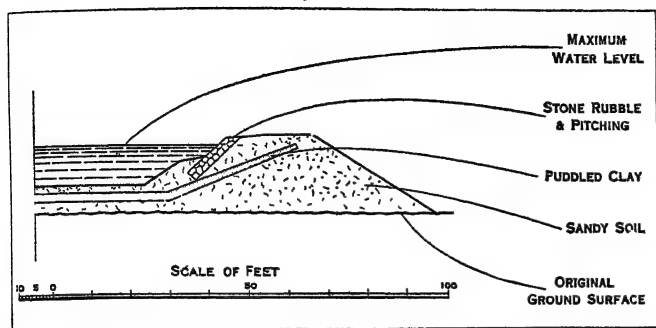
HALF CROSS-SECTION OF A PORTION OF THE DORTMUND-EMŚ CANAL, BUILT ON EMBANKMENT OF PERVIOUS MATERIAL
